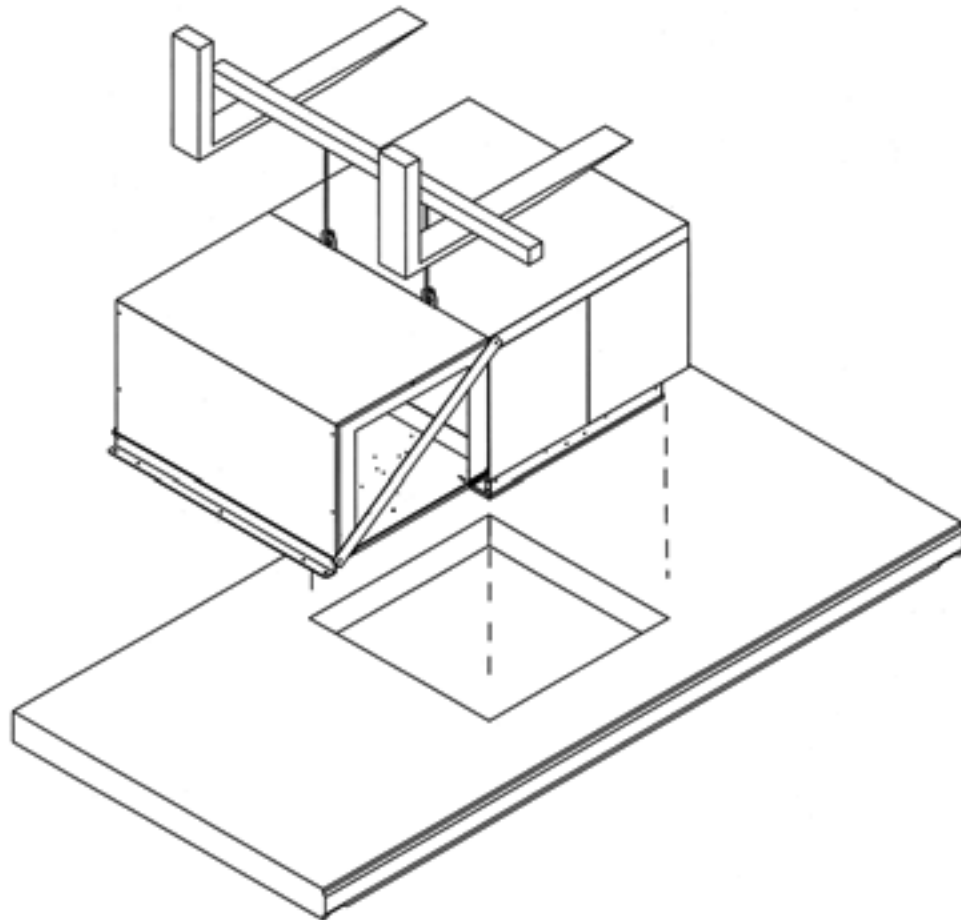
Joining the Top-Mount Refrigeration System to the Ceiling Panel
